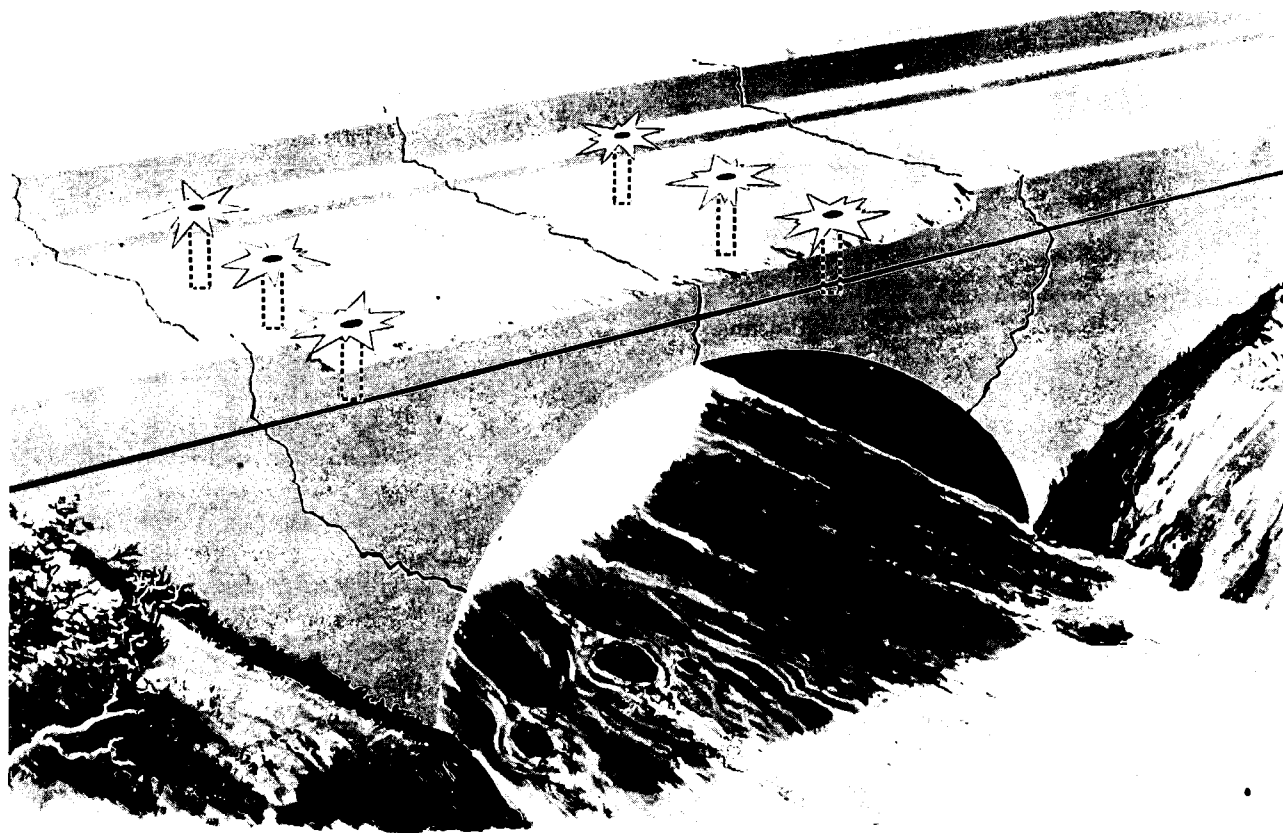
Breaching by haunch charges on filled spandrel arch bridge.
